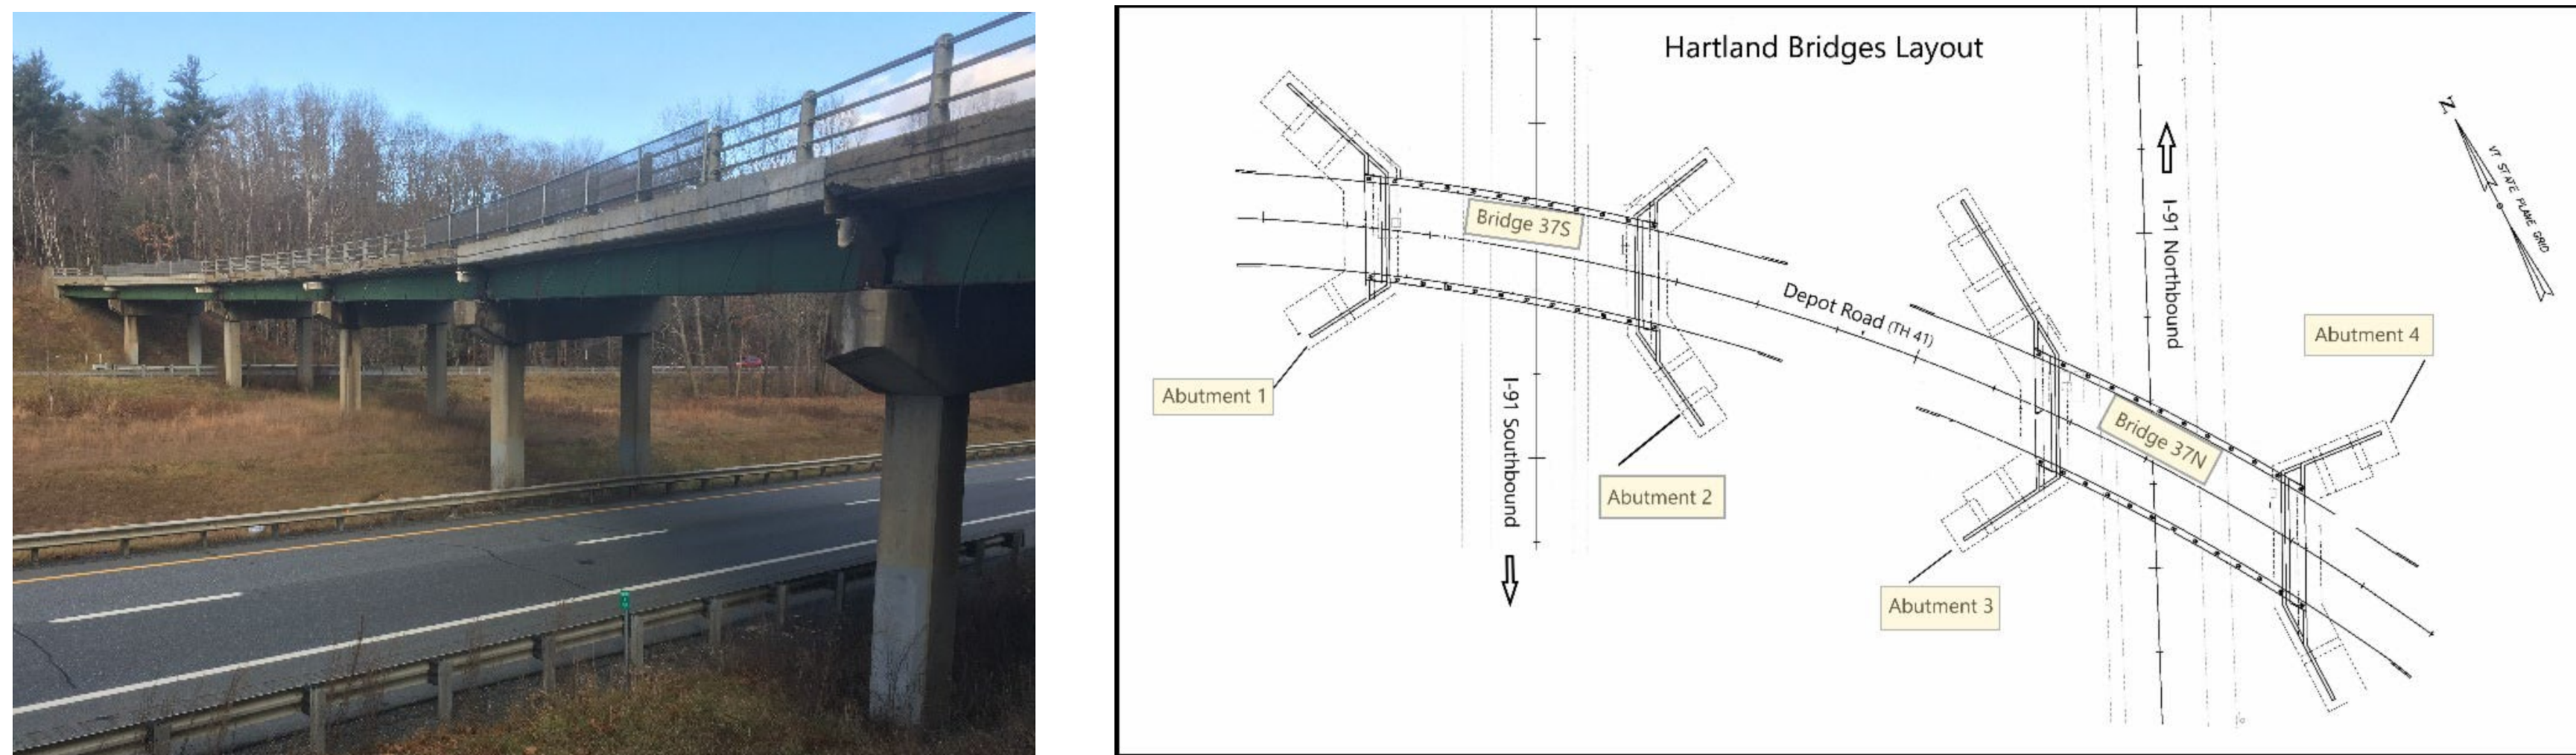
(Left) Existing 6-span bridge, and (Right) Plan of Proposed Bridges
